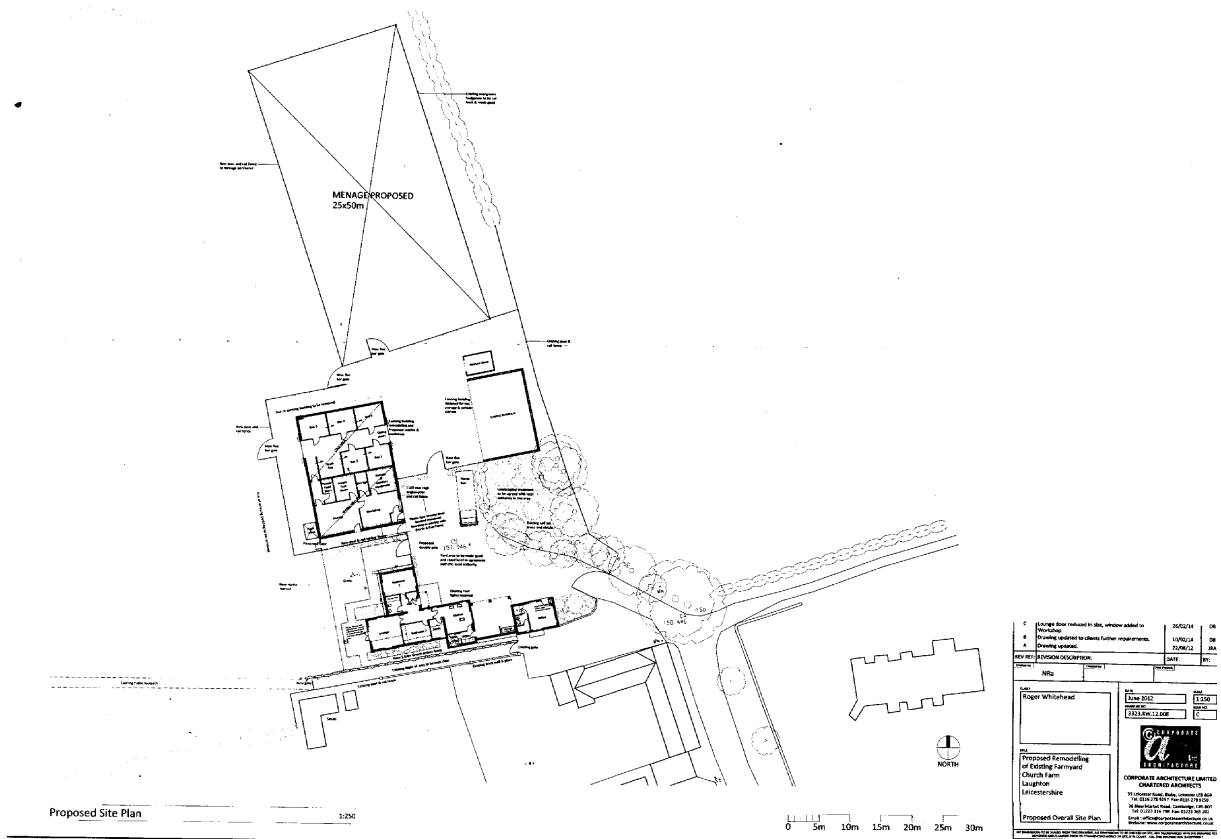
Plan of the proposed development. The northern buildings will utilise existing concrete slabs with no proposed groundworks
